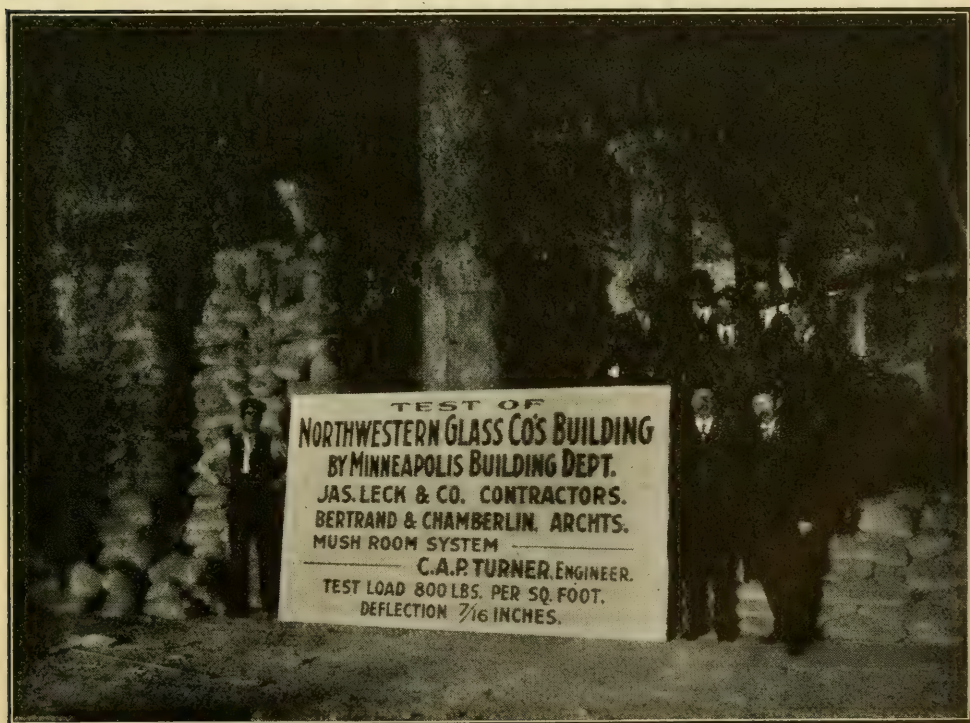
TEST OF NORTHWESTERN GLASS COMPANY'S BUILDING BY
